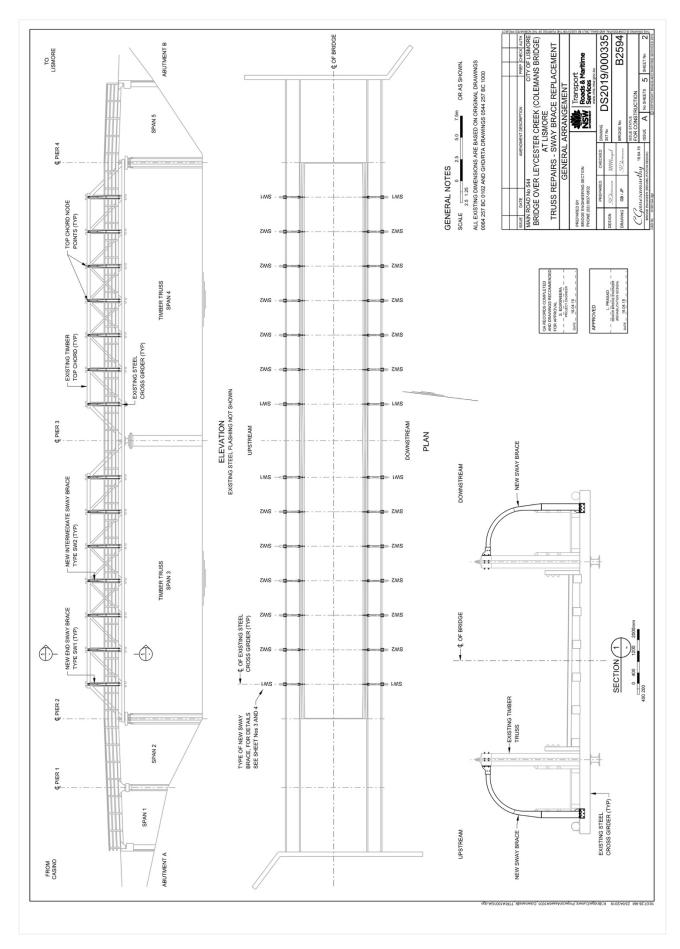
PROPOSED TRUSS REPAIRS – SWAY BRACE GENERAL ARRANGEMENT
